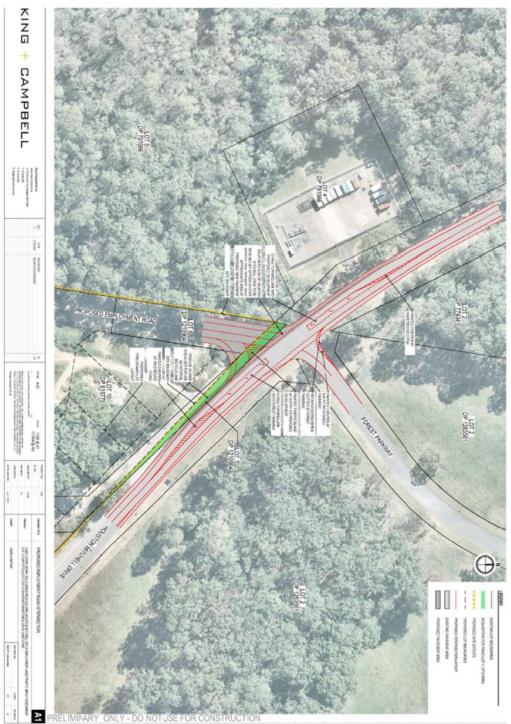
Concept design showing proposed reconfiguration of the existing intersection between Forest Parkway and Houston Mitchell Drive, to include a new southern approach.
